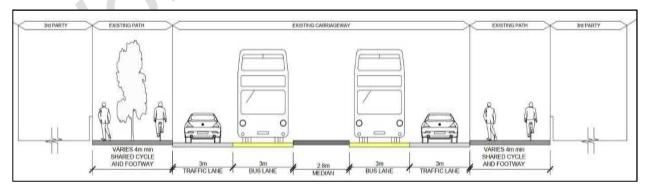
BG5 Cross Section Old Blessington Road (between Junctions 2 and 3).
